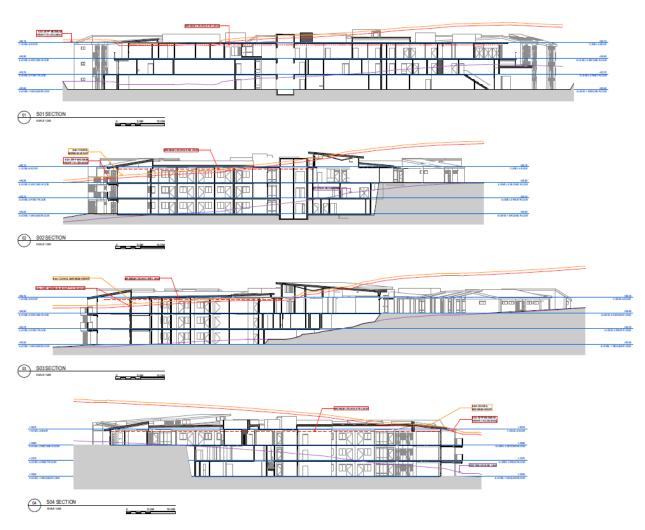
Extract of 'RAC Sections' plan showing cross-section view of proposed building with LEP 8.5m height limit indicated by orange line
